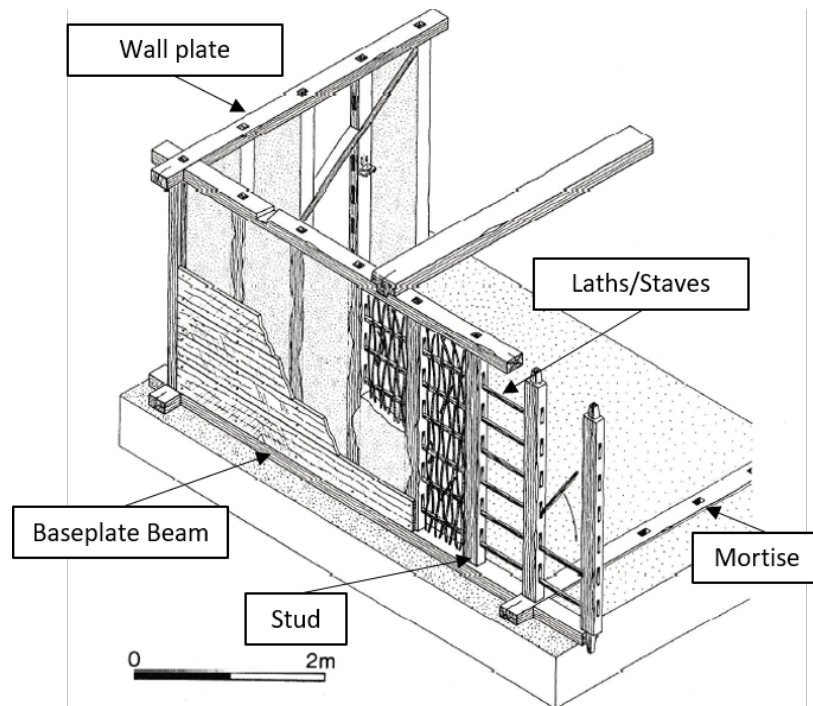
1: Reconstruction drawing showing a timber framed building, reconstructed from the timbers and joints discovered at Cannon Street. (After Goodburn 1991 Fig. 2).
